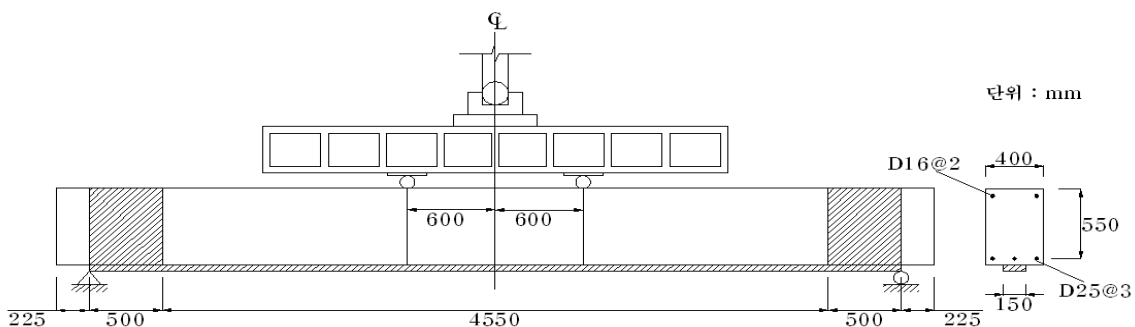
Dimensions of Strengthened RC Beam and Cross Section
